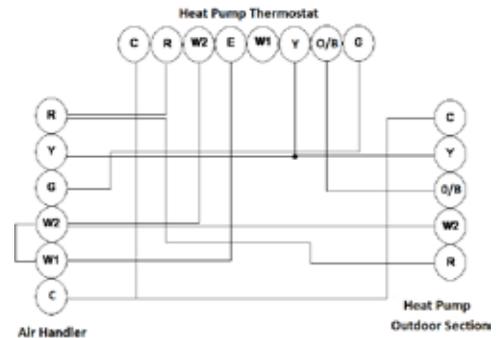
Heat Pump Thermostat Connections - Single Thermostat & Single Transformer in Air Handler
